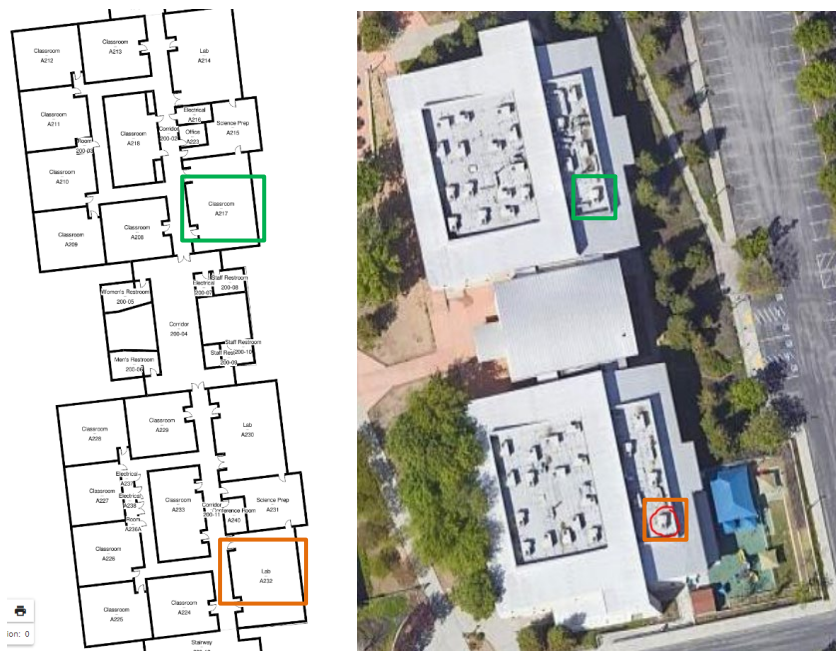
BUILDING A. SECOND STORY FLOOR PLAN (LEFT) AND SATELLITE VIEW (RIGHT)
